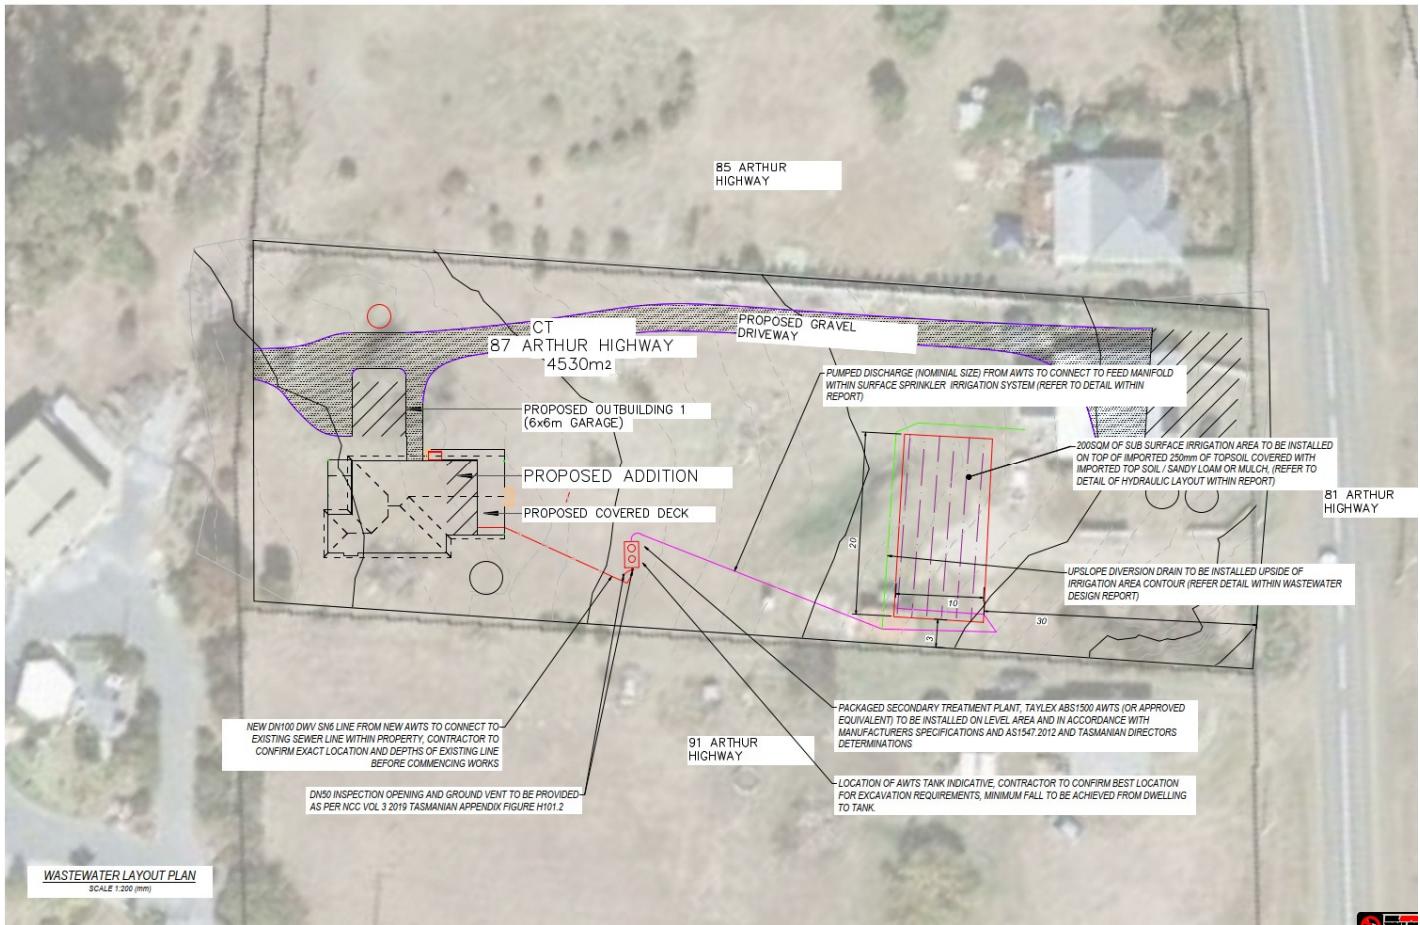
PROPOSED WASTEWATER SITE LAYOUT
